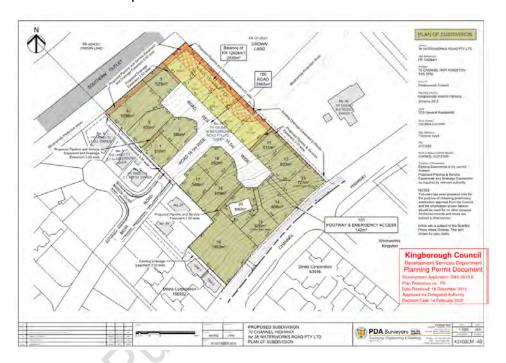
Approved Plan of Subdivision DAS-2019-6.
